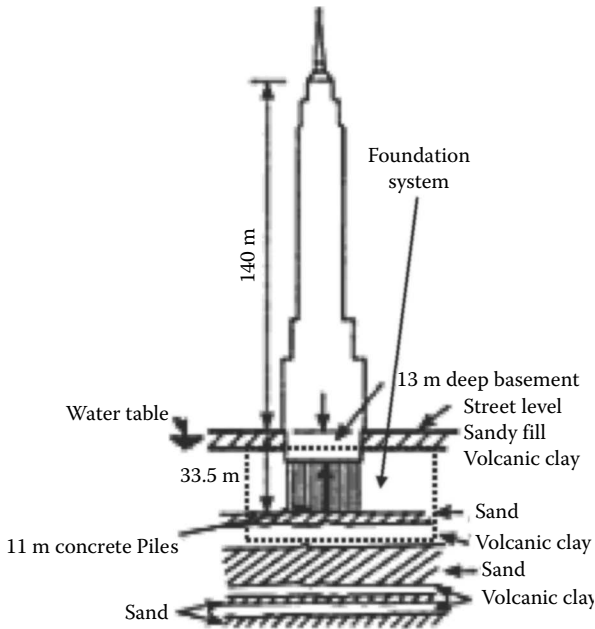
Foundation arrangement of the Latino Americana Tower. (After Tomlison, M.J., Boorman, R. 2001: *Foundation Design and Construction*. Longman Scientific Technical.)
